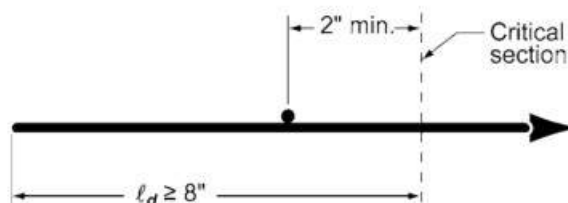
Development of Deformed Welded Wire Reinforcement (adapted from ACI 318-14, courtesy of ACI)
